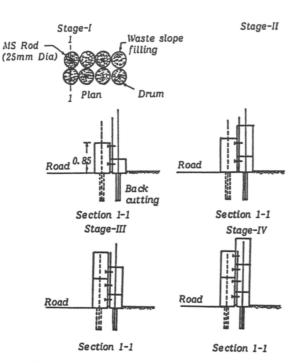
SEQUENCE OF CONSTRUCTION OF ANCHORED DRUM DIAPHRAGM WALL
